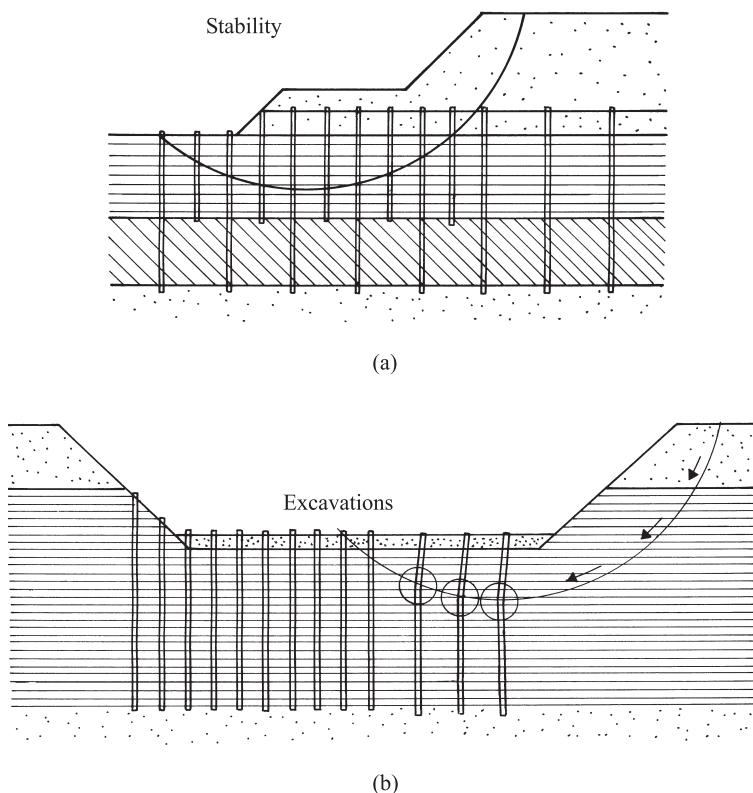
Vertical drains to enhance stability of slope and bottom of excavation.
